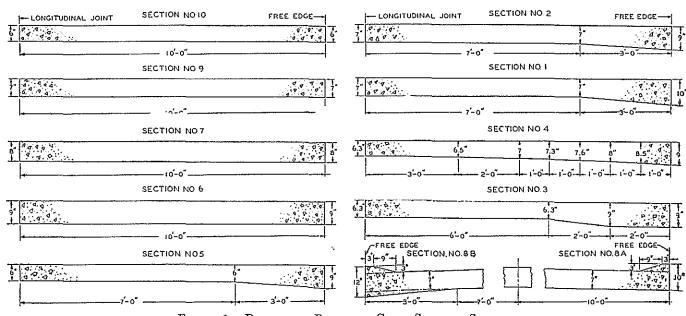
DESIGNS OF PAVEMENT CROSS SECTIONS STUDIED.
